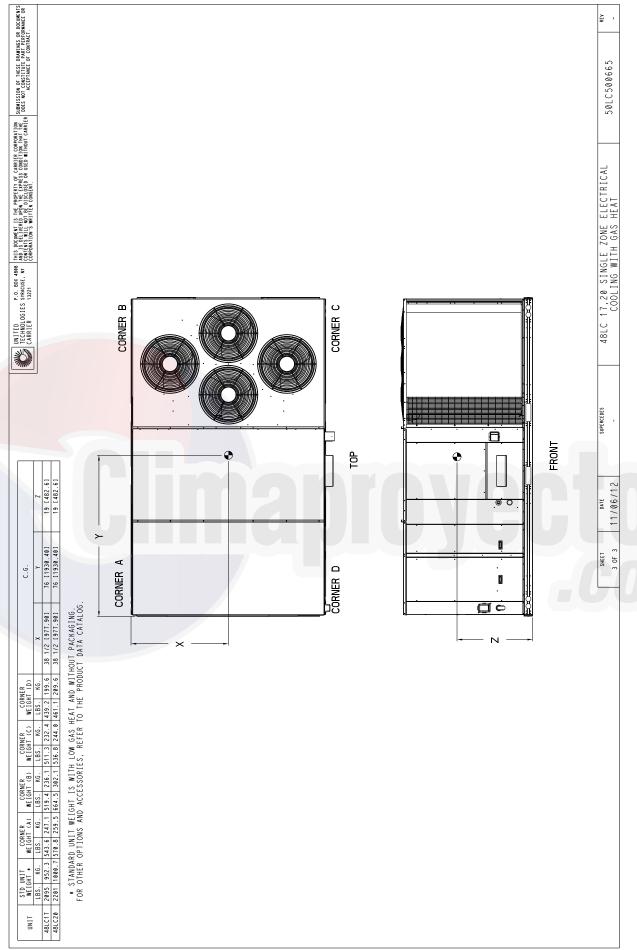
(cont.) - Unit Dimensional Drawing $\,-\,17$ and 20 Size Units, Sheet 3 of 3
